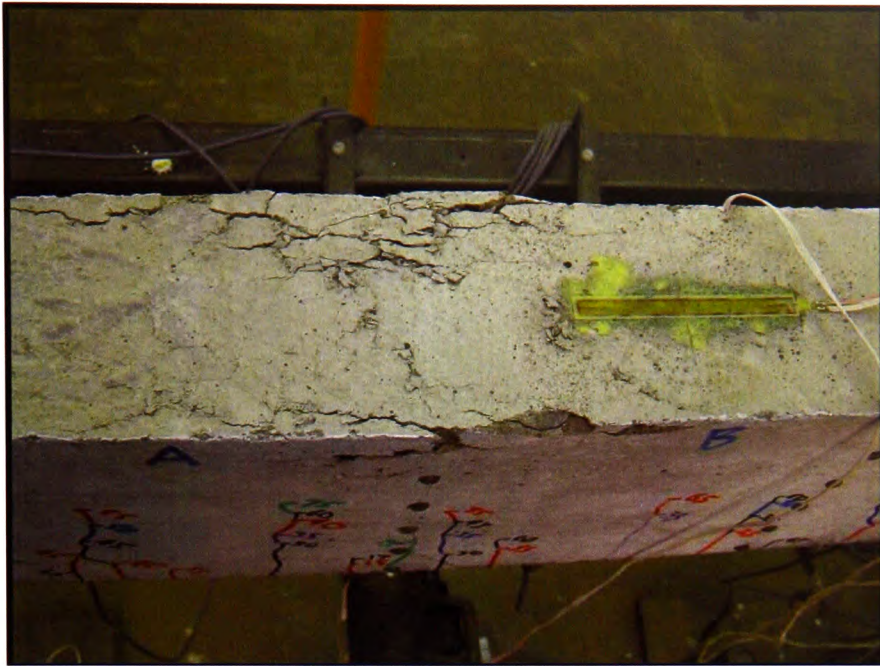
Photograph of compressive concrete failure of 12CF2
